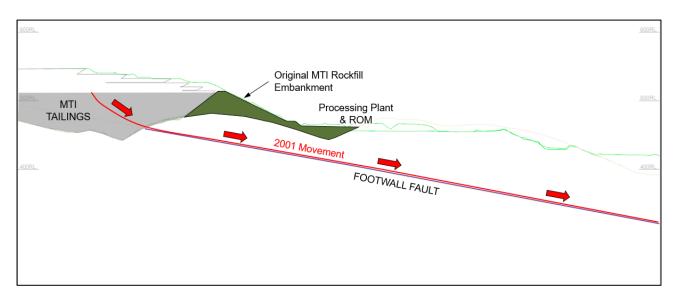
Cross-section at 15,150 m Y, looking north, showing RHOP, MTI, and Footwall Fault
